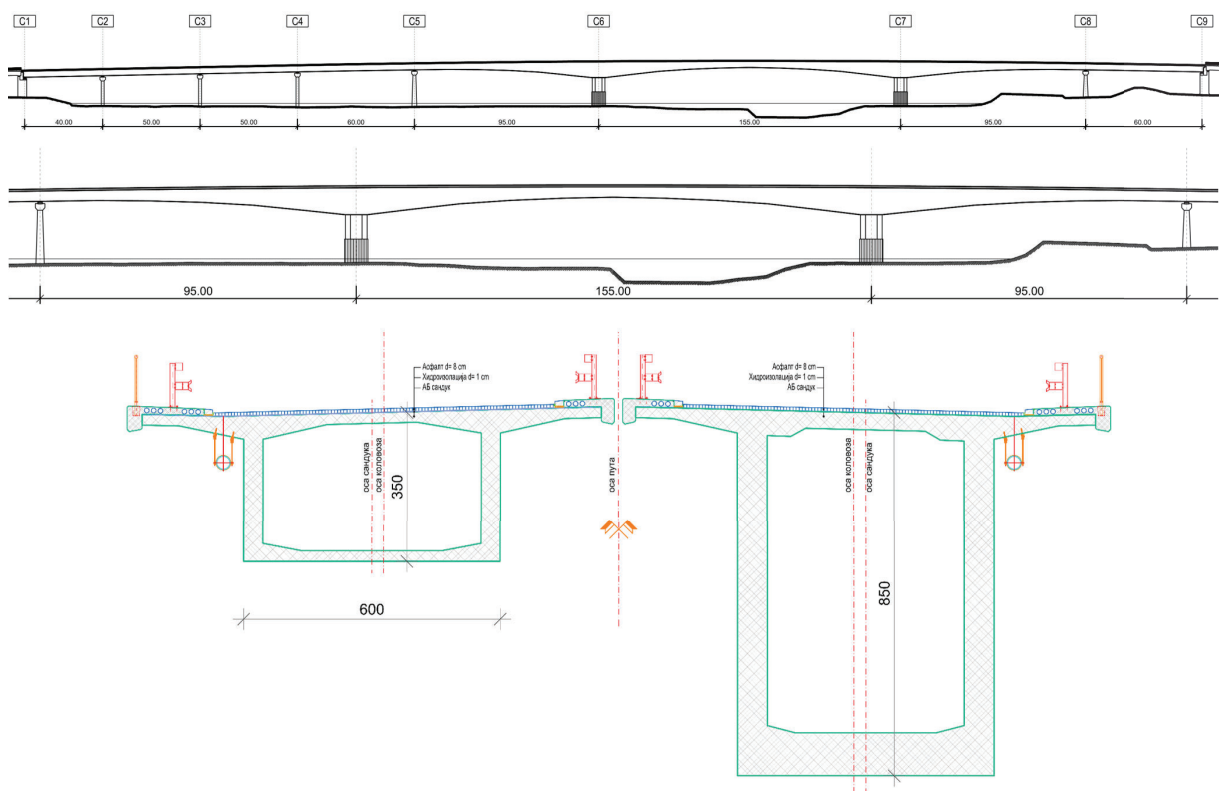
Highway Bridge across the Sava River – Side View and Plan View [6]
